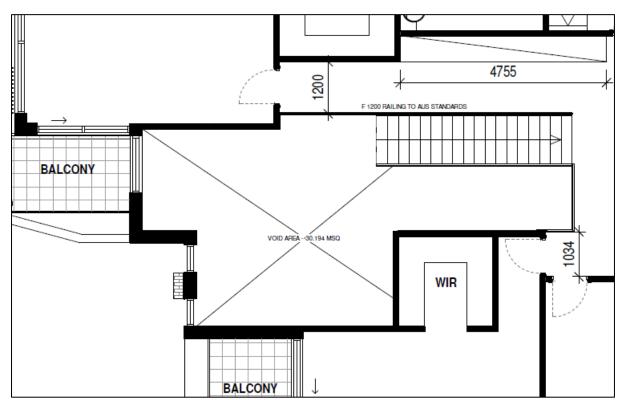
Originally proposed void space adjacent to the stairwell and above living room.
